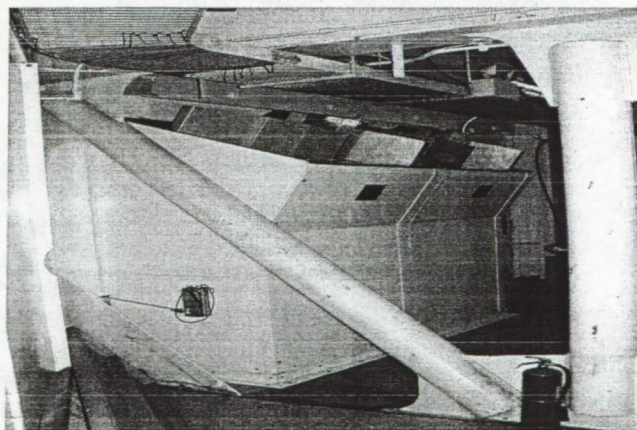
New double Exhaust Hoods installed in place of Old Inlet fans
